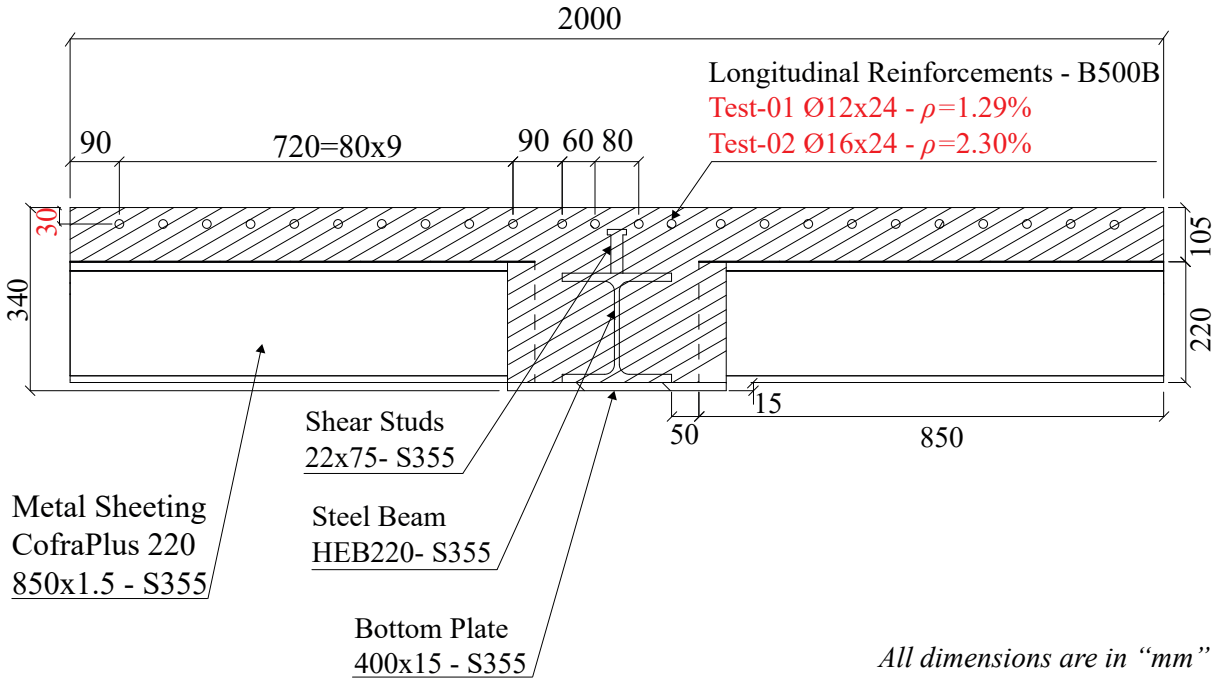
Cross-sectional view of the tested composite slim-floor beams.
